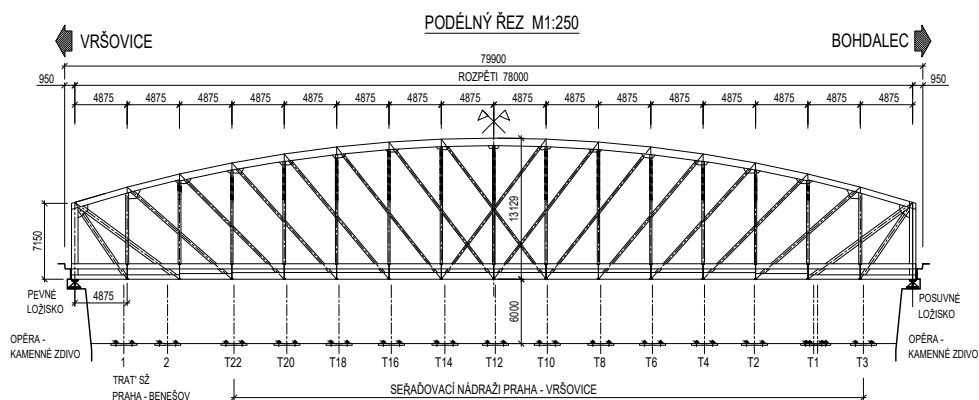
(a, b) Truss bridge with lower bridge deck with upper parabolic chord (road bridge in Prague-Bohdalec from 1915)
